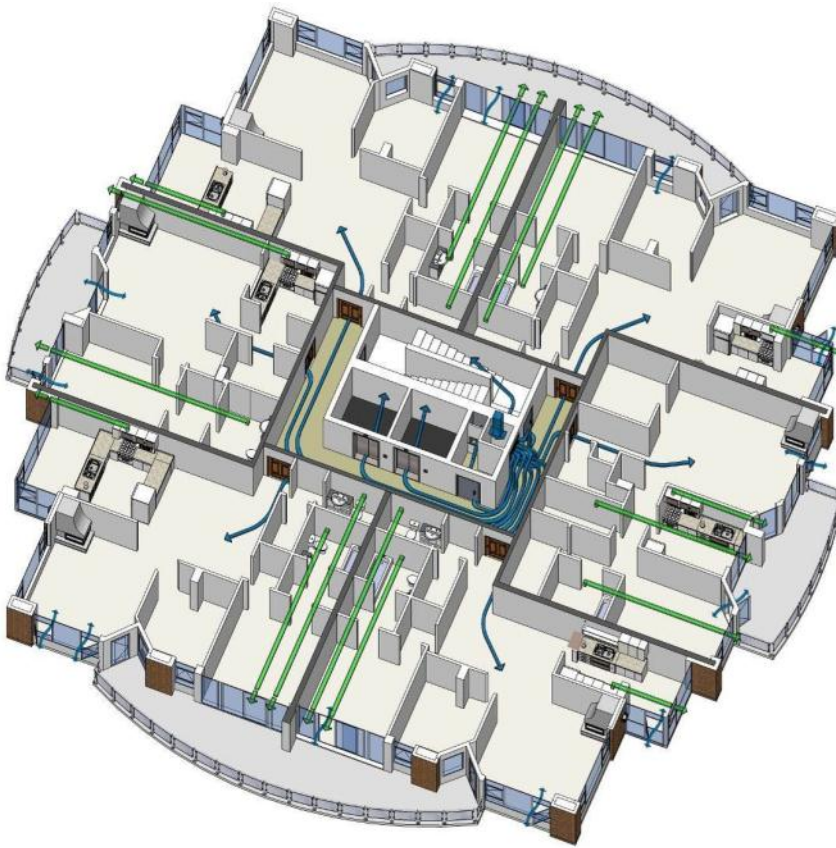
Schematic of Typical MURB floor showing a typical Pressurized Corridor Ventilation Approach. Blue arrows show supply airflows and green arrows show exhaust airflows.
